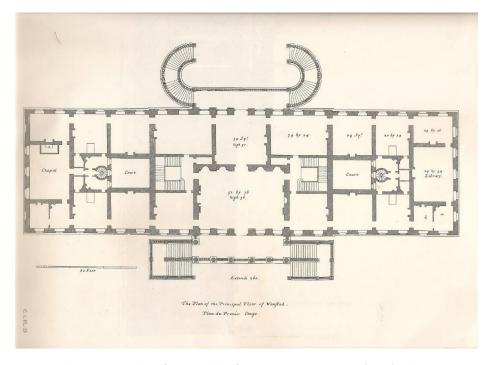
Wanstead House room plan of piano nobile, from Vitruvius Britannicus (1715), plate 23
